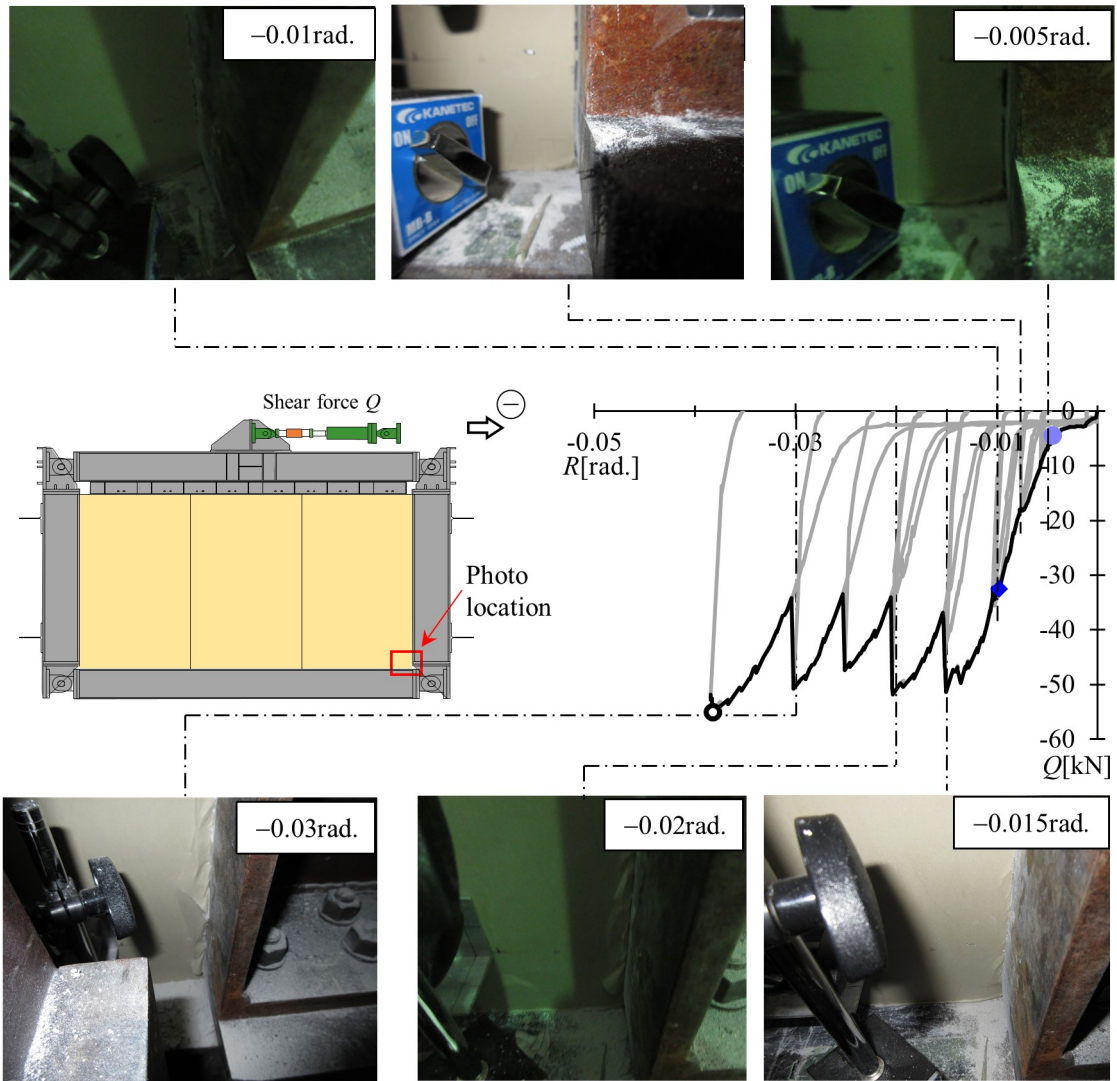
Damage to the gypsum board at loading cycle from 0.005 rad to 0.03 rad (Specimen S12.5\*4, lower right corner, reverse).
